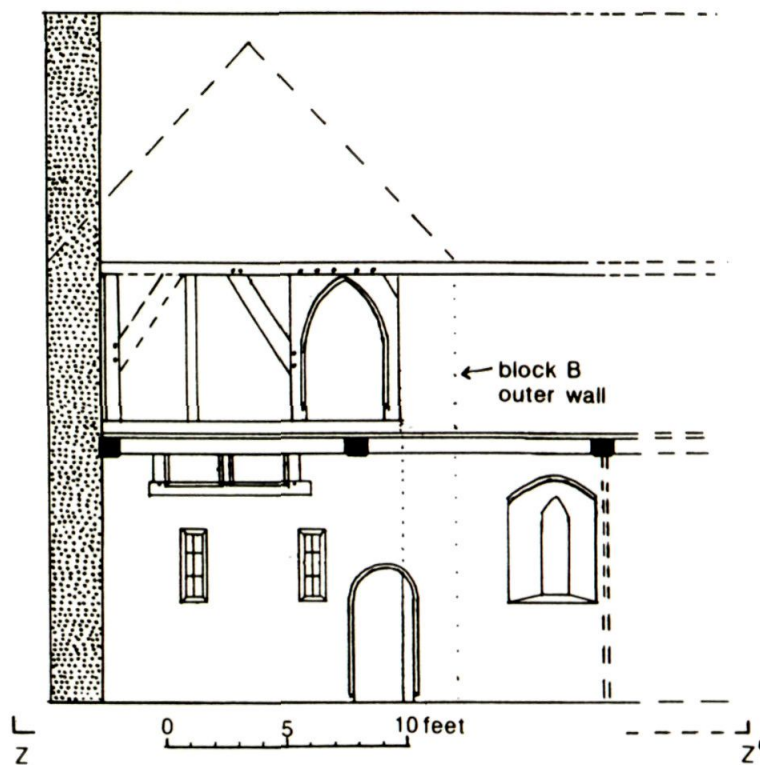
Part of the internal south wall of the solar range, showing (at ground floor level) the small rectangular windows which were originally external to block B. The round-headed door below and the arched door above gave access between block B and the solar range.
